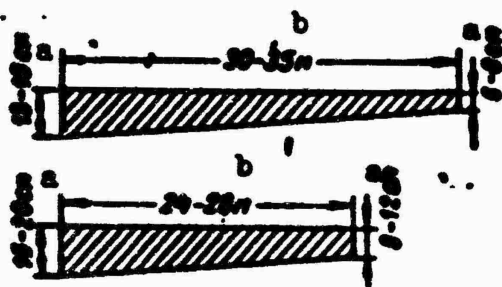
Wedge schemes of cutting in excavating sandy loam and argillaceous sand soils using D-222 scrapers. a) cm; b) meters.
